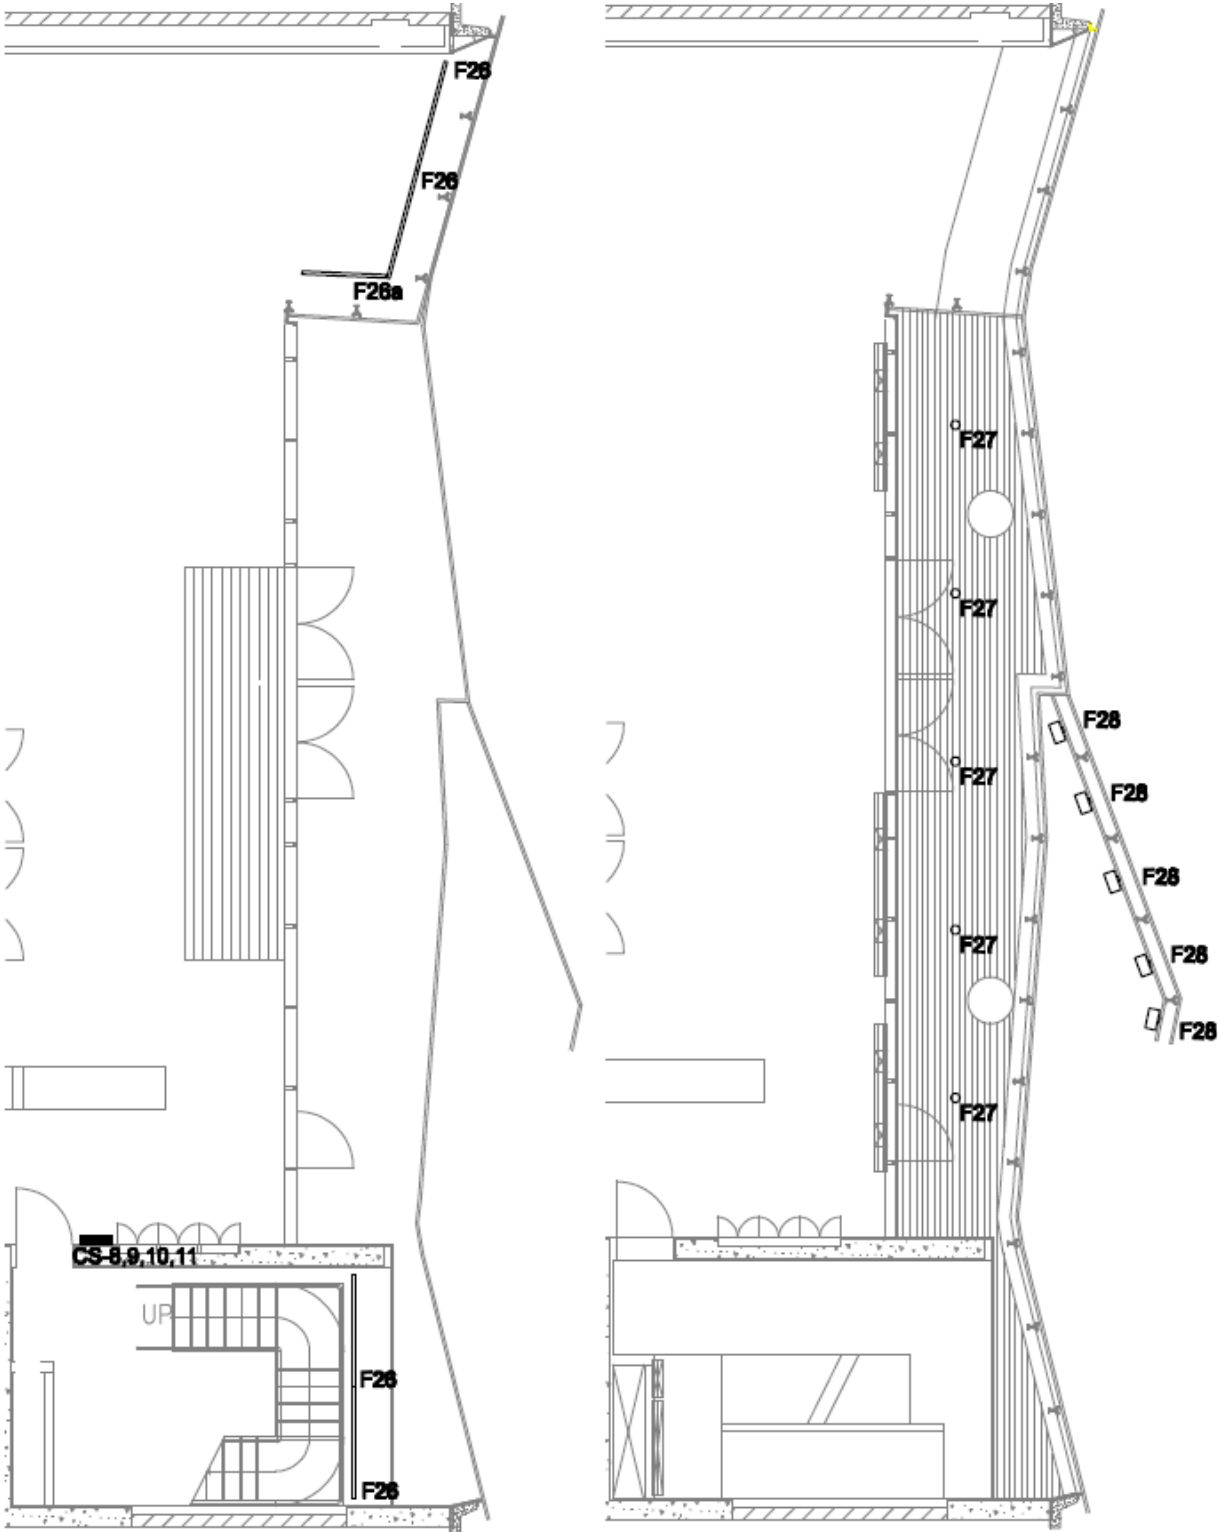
LIGHTING FLOOR PLAN (LEFT)
